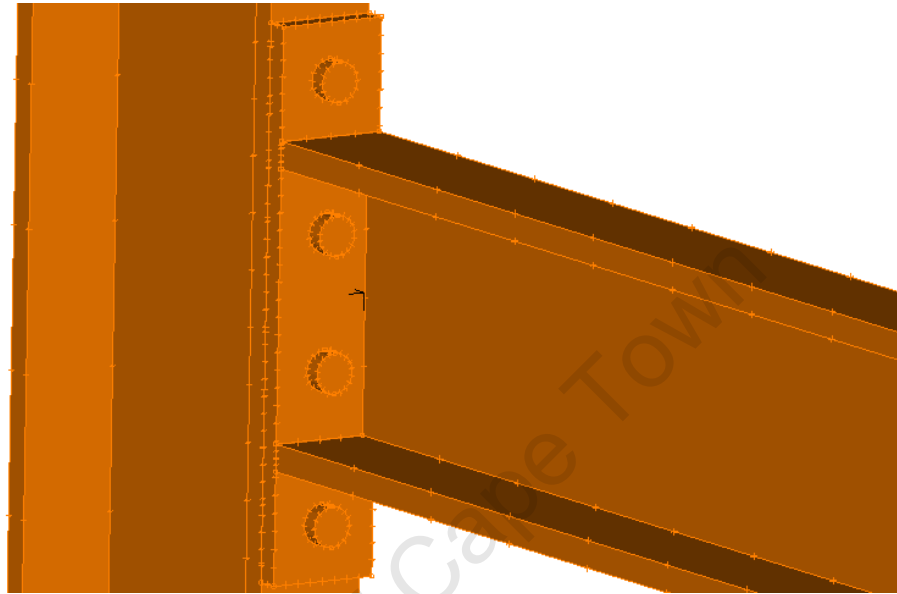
Beam – Column Endplate Connection (ADINA)
